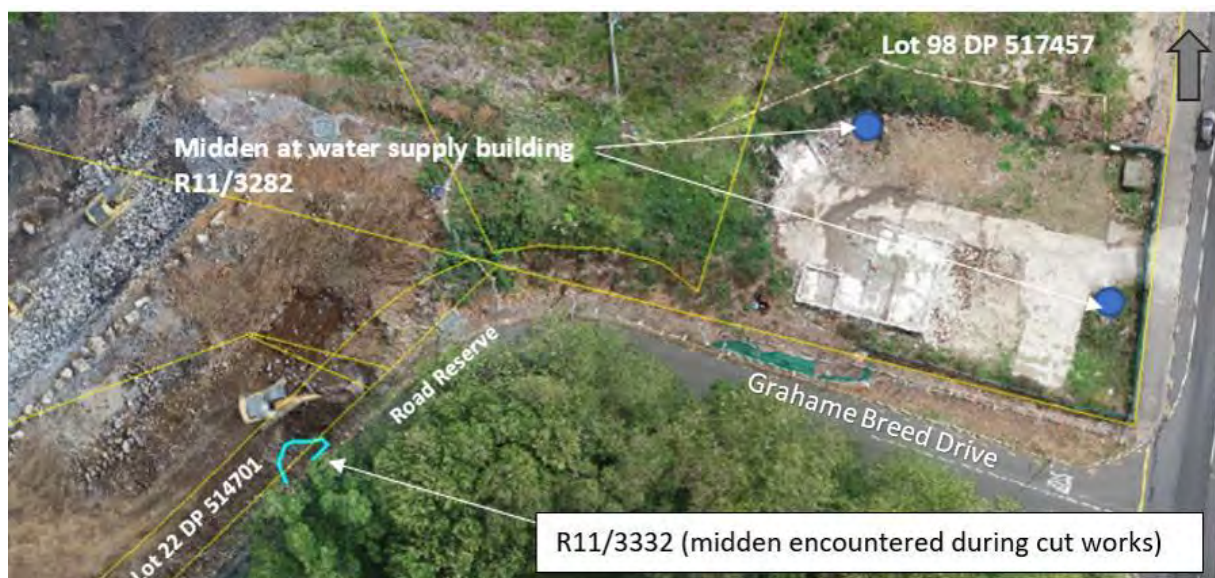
Aerial plan showing the location of midden R11/3332 in relation to the previously recorded midden R11/3282 (source: Cameron 2021a)
